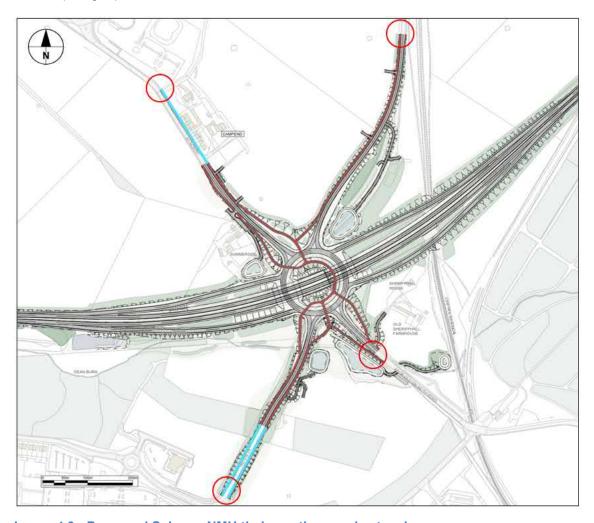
Proposed Scheme NMU tie-in sections and extensions
